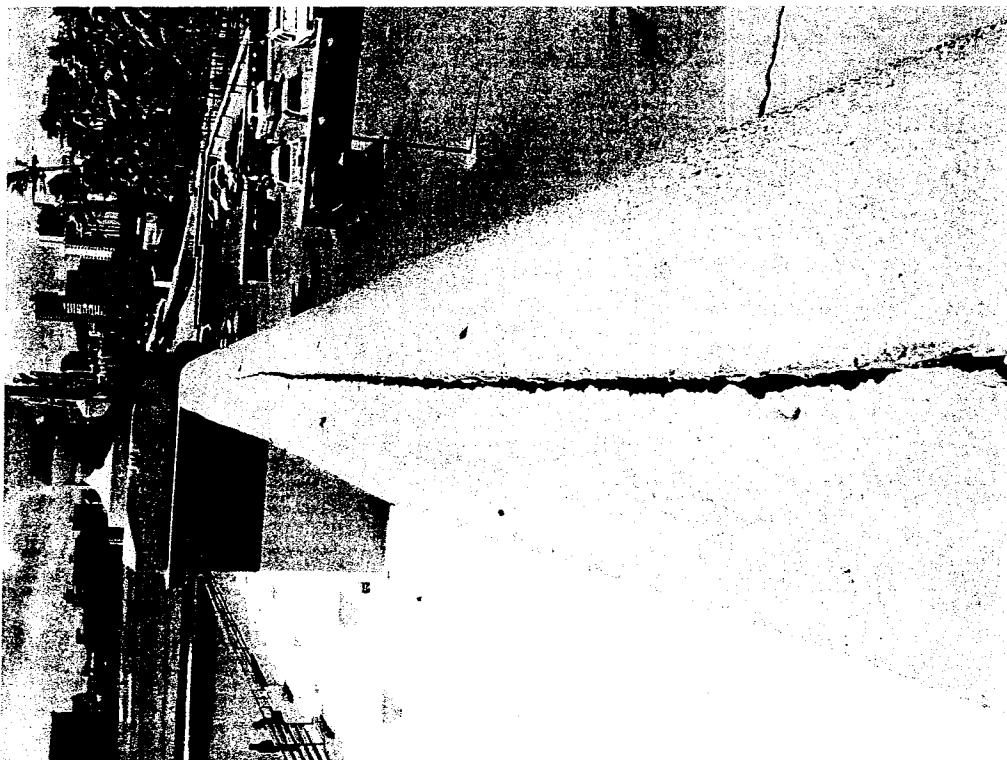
Cracking at Top of Bleacher Seating Wall Finish
